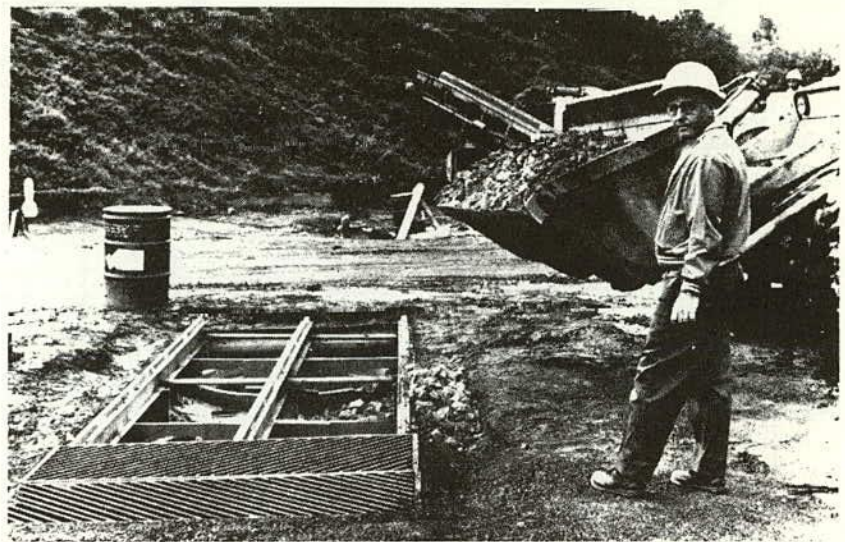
Construction of collecting basin: backfilling around the 4-ft diameter, vertical concrete pipe sections (Pennsylvania).
